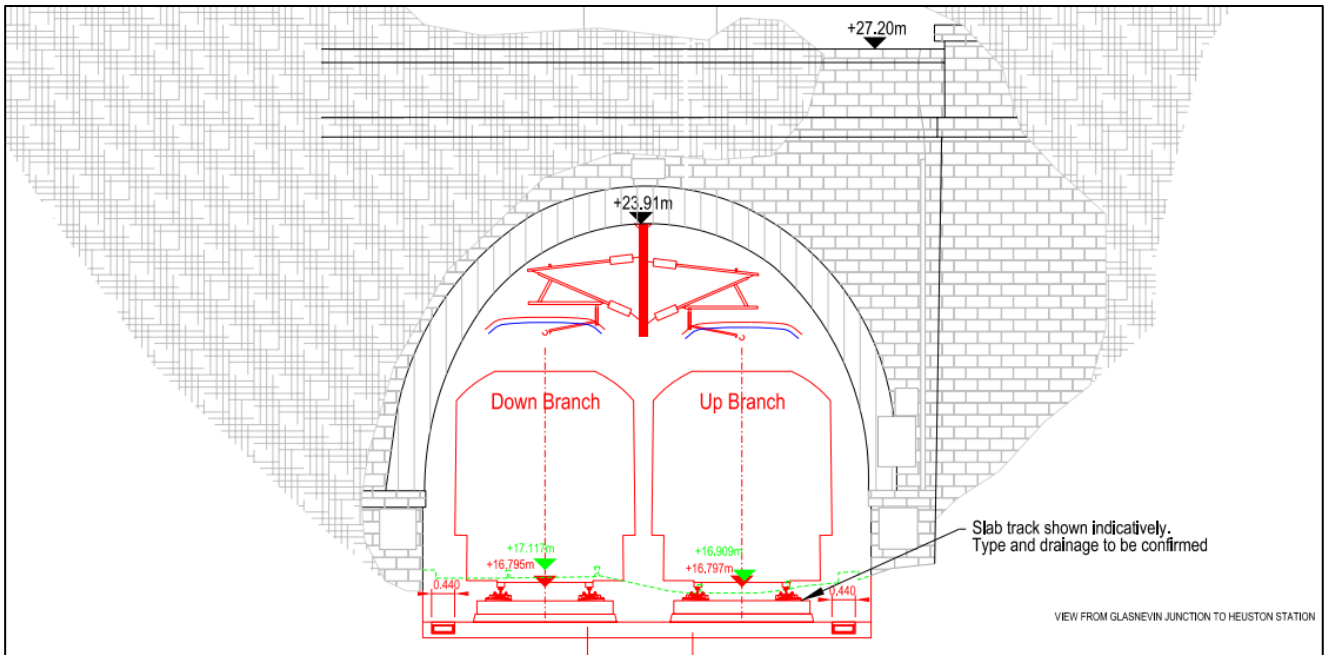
Phoenix Park Tunnel – Cross section at Ch 8+056 – view from Glasnevin Junction
